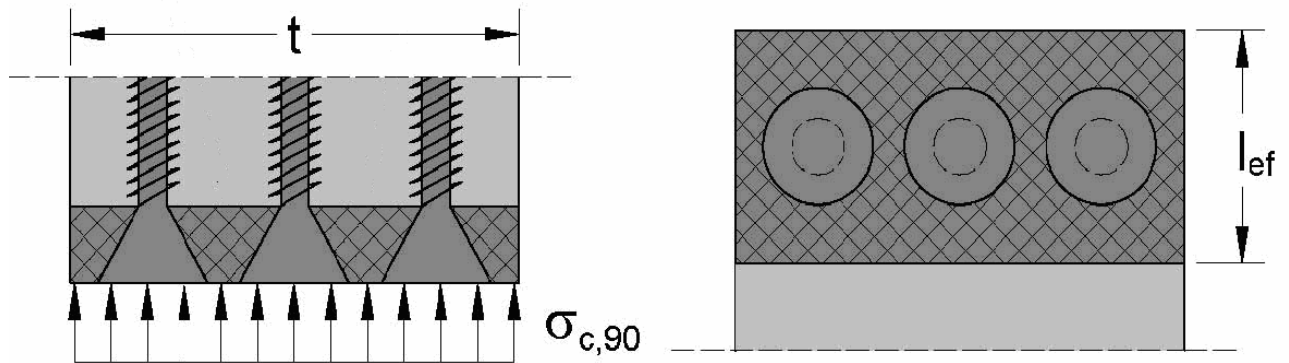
Configuration of the screws in the plate (left), View from the bottom (right), [8]
